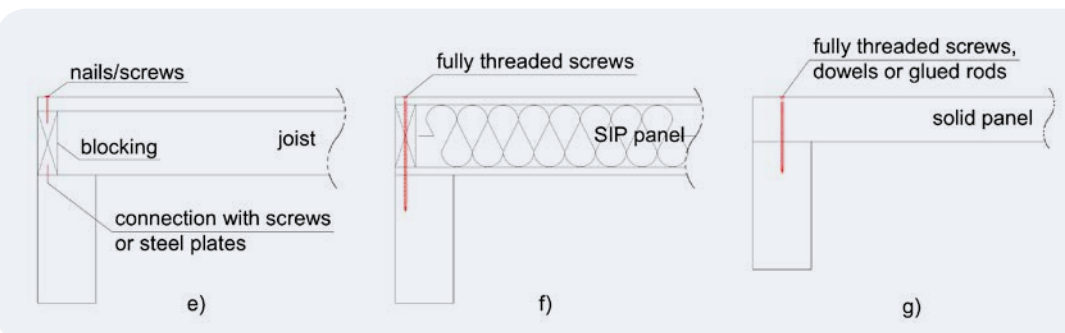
Suggested diaphragm to frame connections (floor joists on top of beam): e) floor joist sitting on beam – additional blocking required; f) SIP panel on beam; g) solid timber floor on beam.
